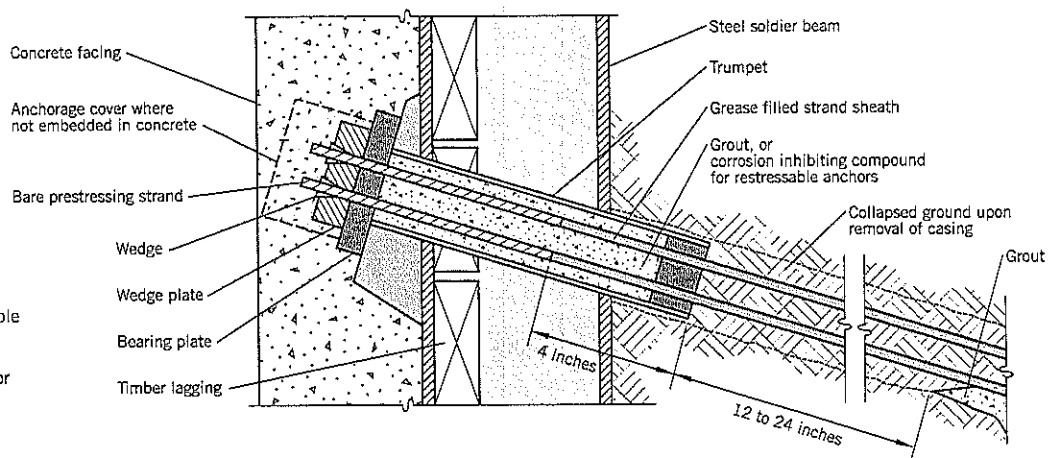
Example of anchorage to wall detail for a strand tendon ground anchor (after Sabatini et al., 1999).
